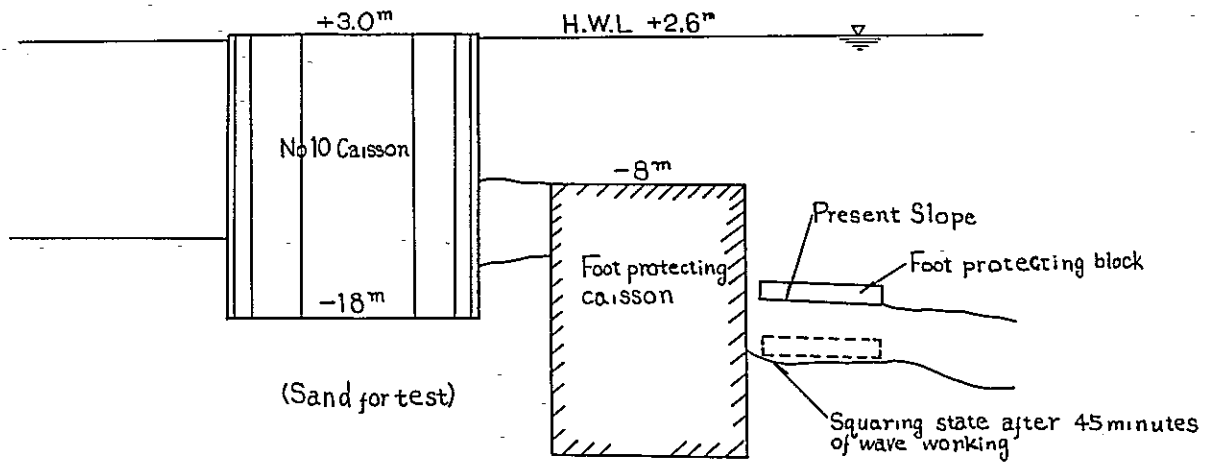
Examination in case of laying caissons and blocks with no joints for foot protection.
